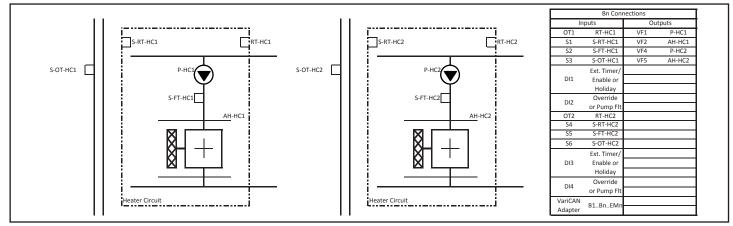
EXTENSION MODULE WITH 2 X AIR HANDLER CIRCUITS
